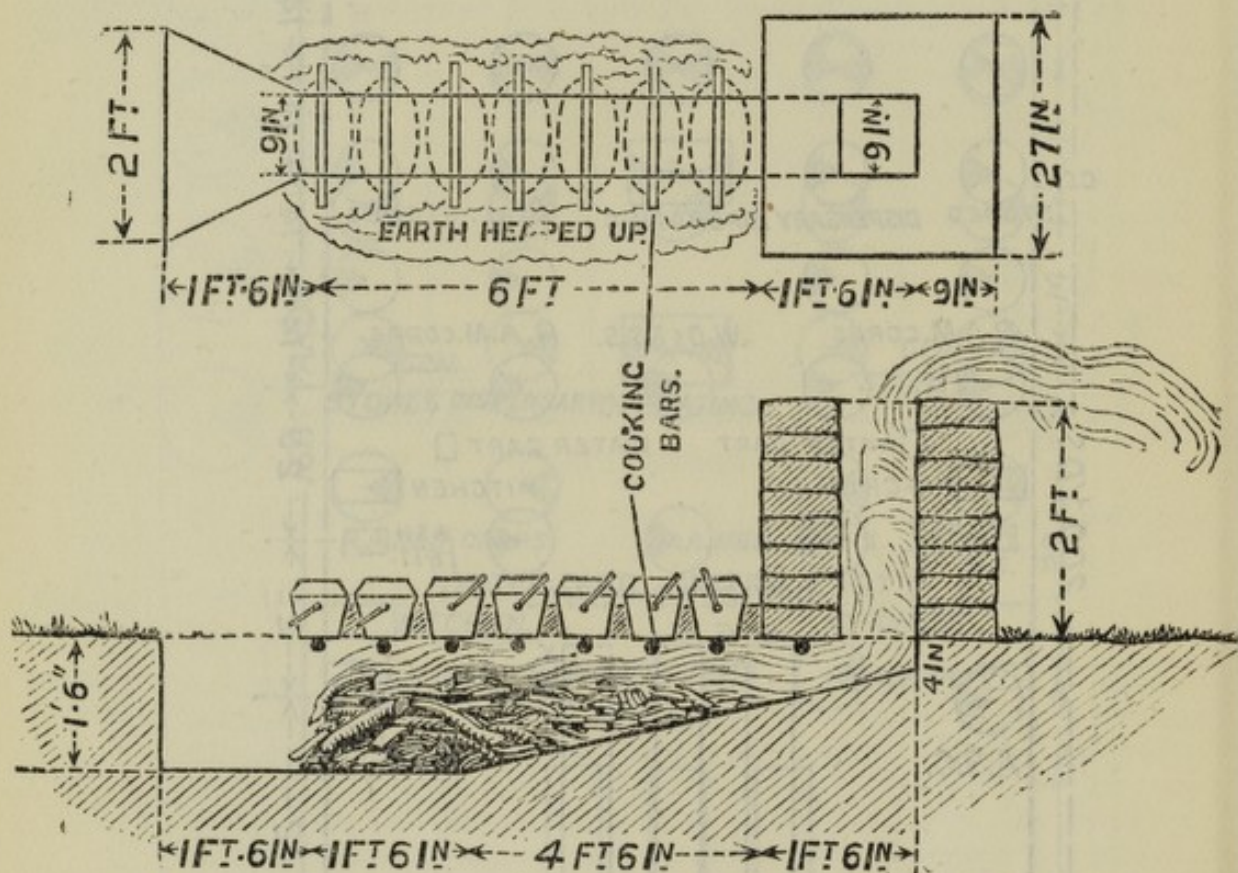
PLAN AND SECTIONAL ELEVATION OF TRENCH KITCHEN WITH CAMP KETTLES, TO SHOW DIMENSIONS AND DETAIL.
